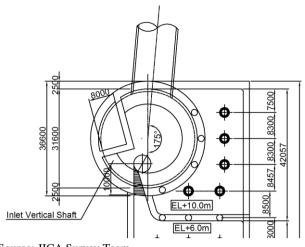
Plan Drawing of Inlet Vertical Shaft, Parañaque Spillway
